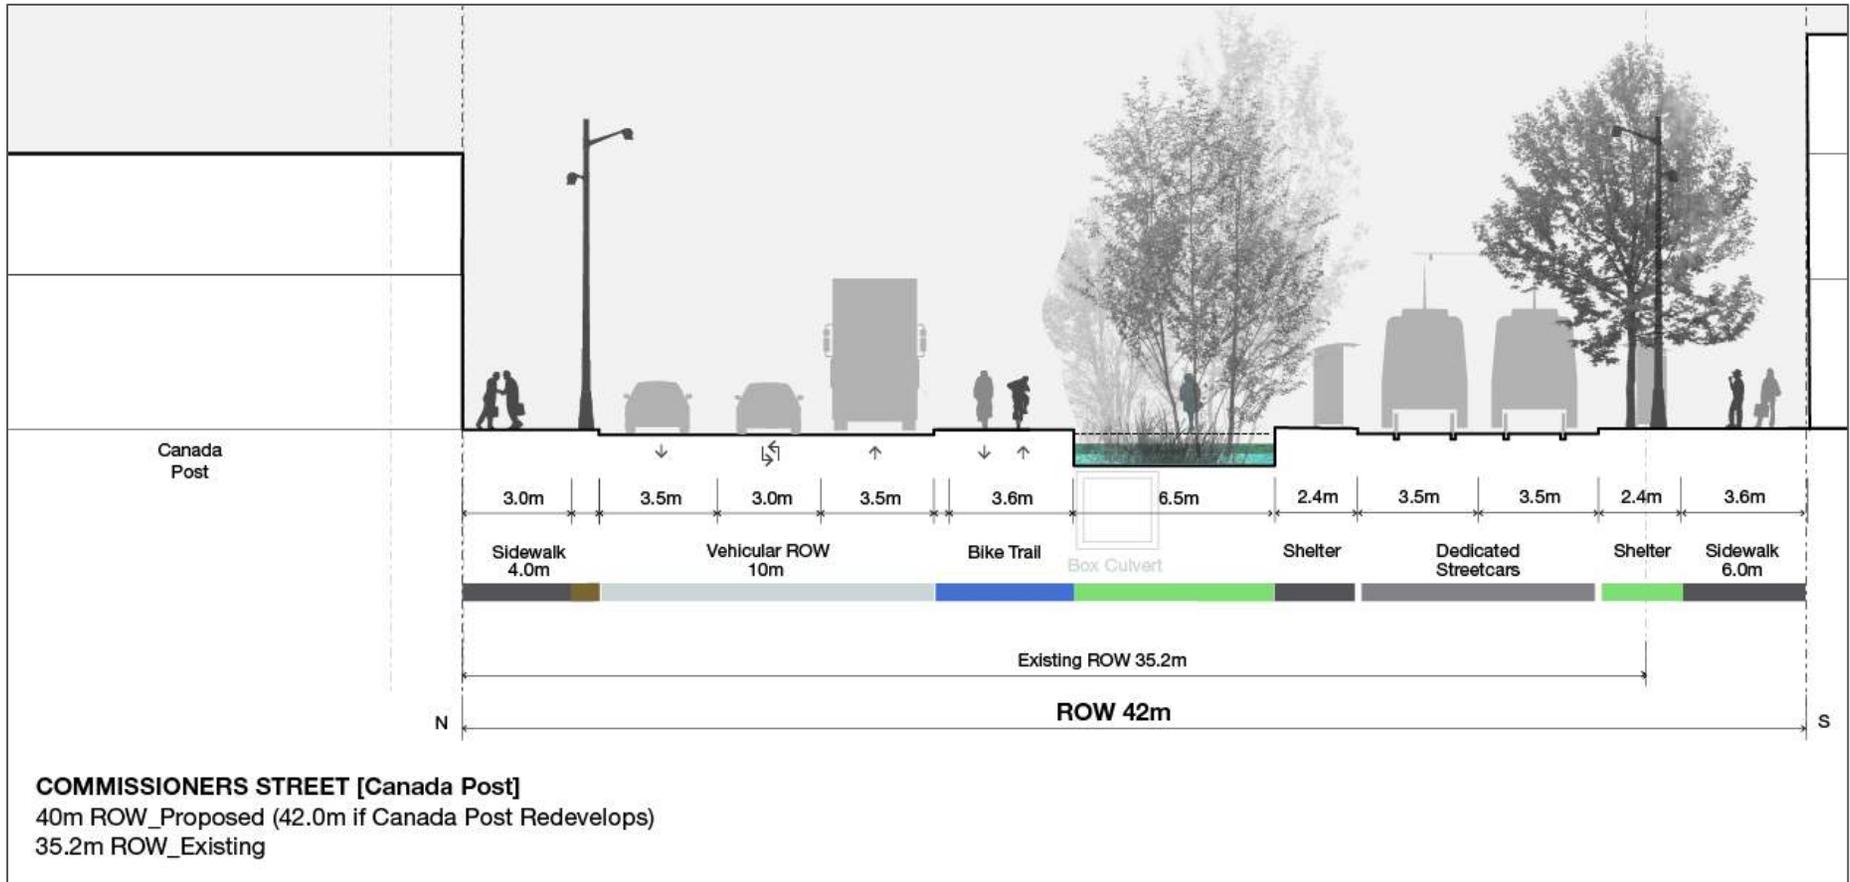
CONCEPTUAL CROSS-SECTION – COMMISSIONERS STREET, FOUR LANES
